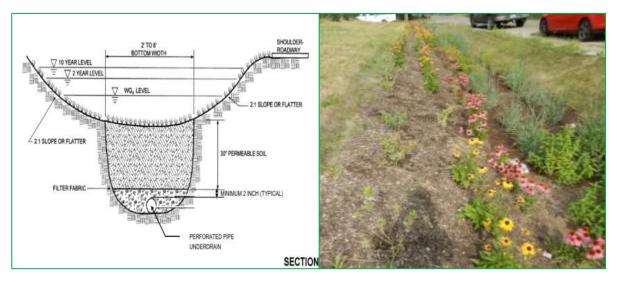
TYPICAL SWALE DESIGN SECTION VIEW (LEFT) AND BIOSWALE INSTALLATION (RIGHT)
